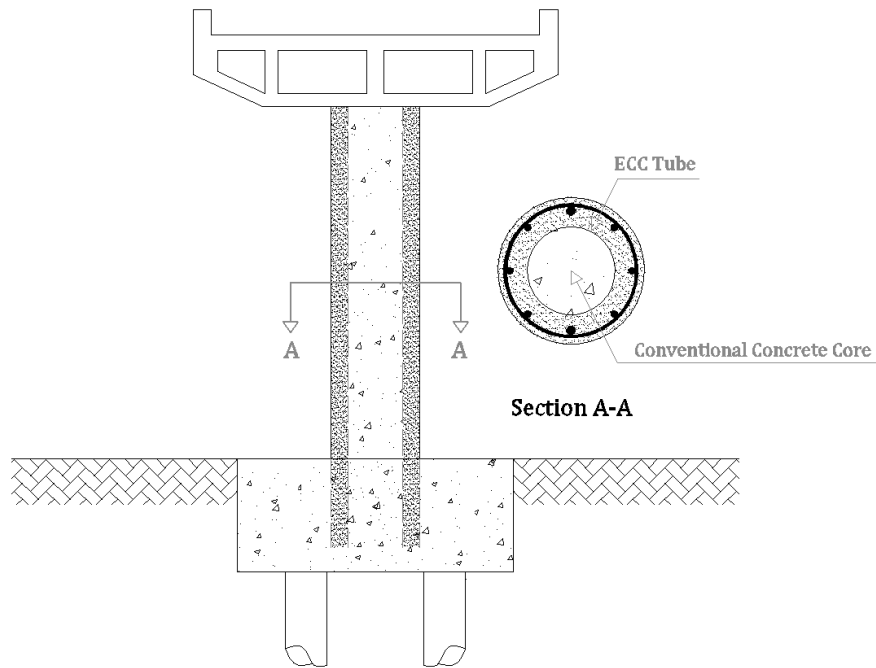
PROPOSED BRIDGE COLUMN DESIGN
